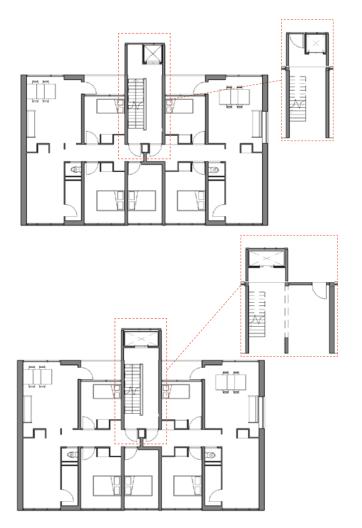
Floor plans showing 2 alternatives for approach 1
